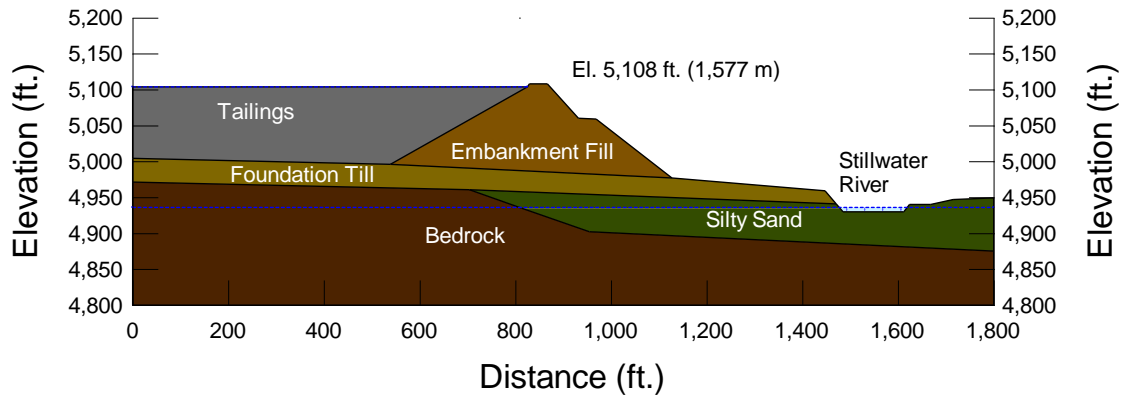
Typical Nye Tailings Impoundment Embankment Cross Section
